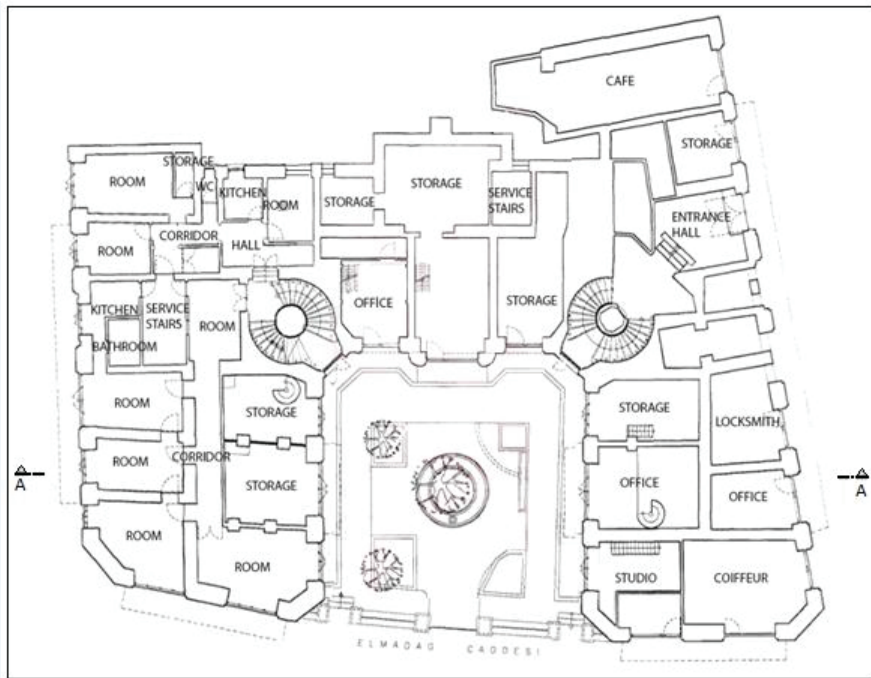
Mezzanine floor plan of Arif Pasha Apartment ( Source: Öğrenci 1998)
